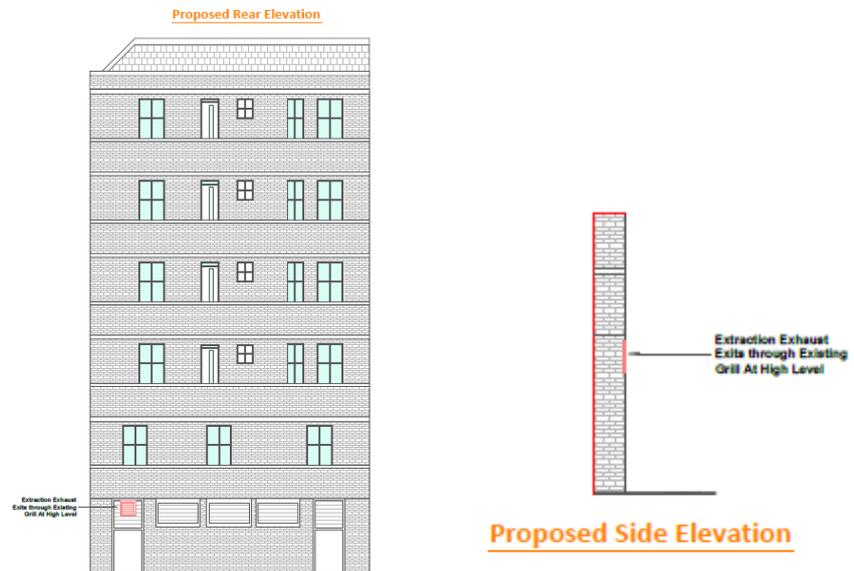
Proposed rear elevation and side elevation drawings showing external alterations
